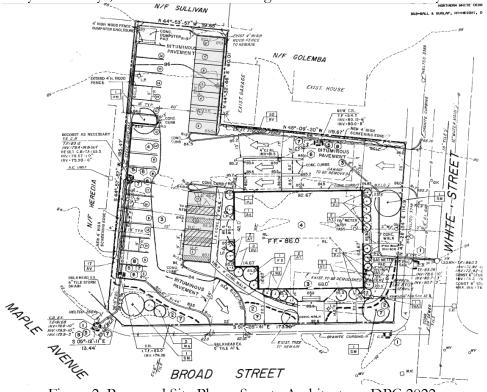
Proposed Site Plan - Swartz Architecture, DPC 2022
